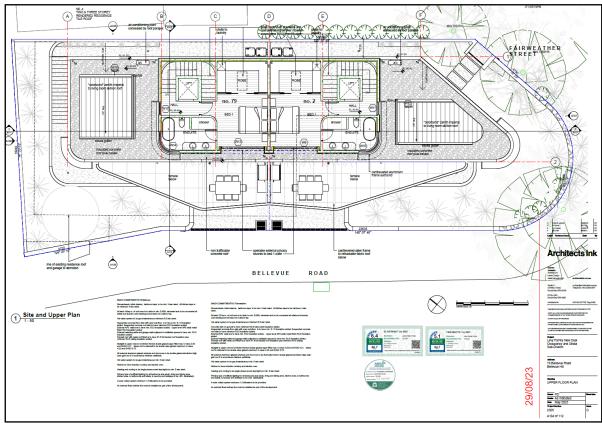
Upper floor plan. Source: Submitted Architectural Plan
